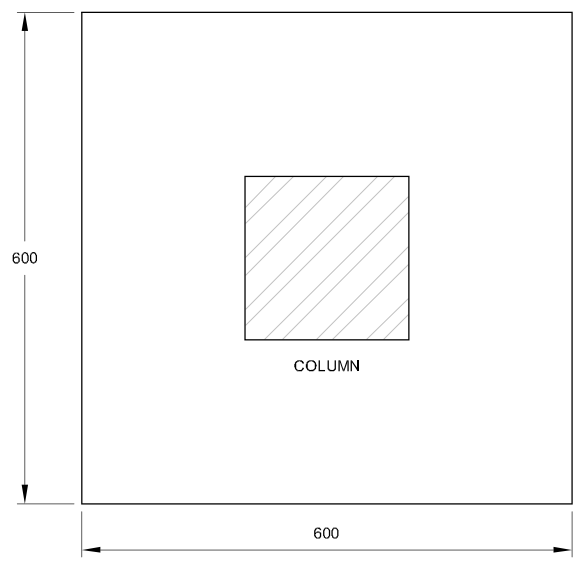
A SINGLE FOOTING SECTIONAL PLAN
